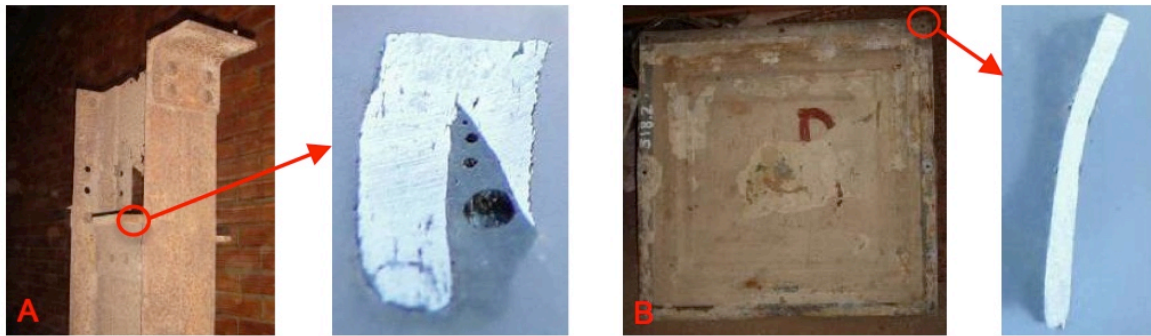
Samples taken from a pillar (A) and wall sheet (B).
